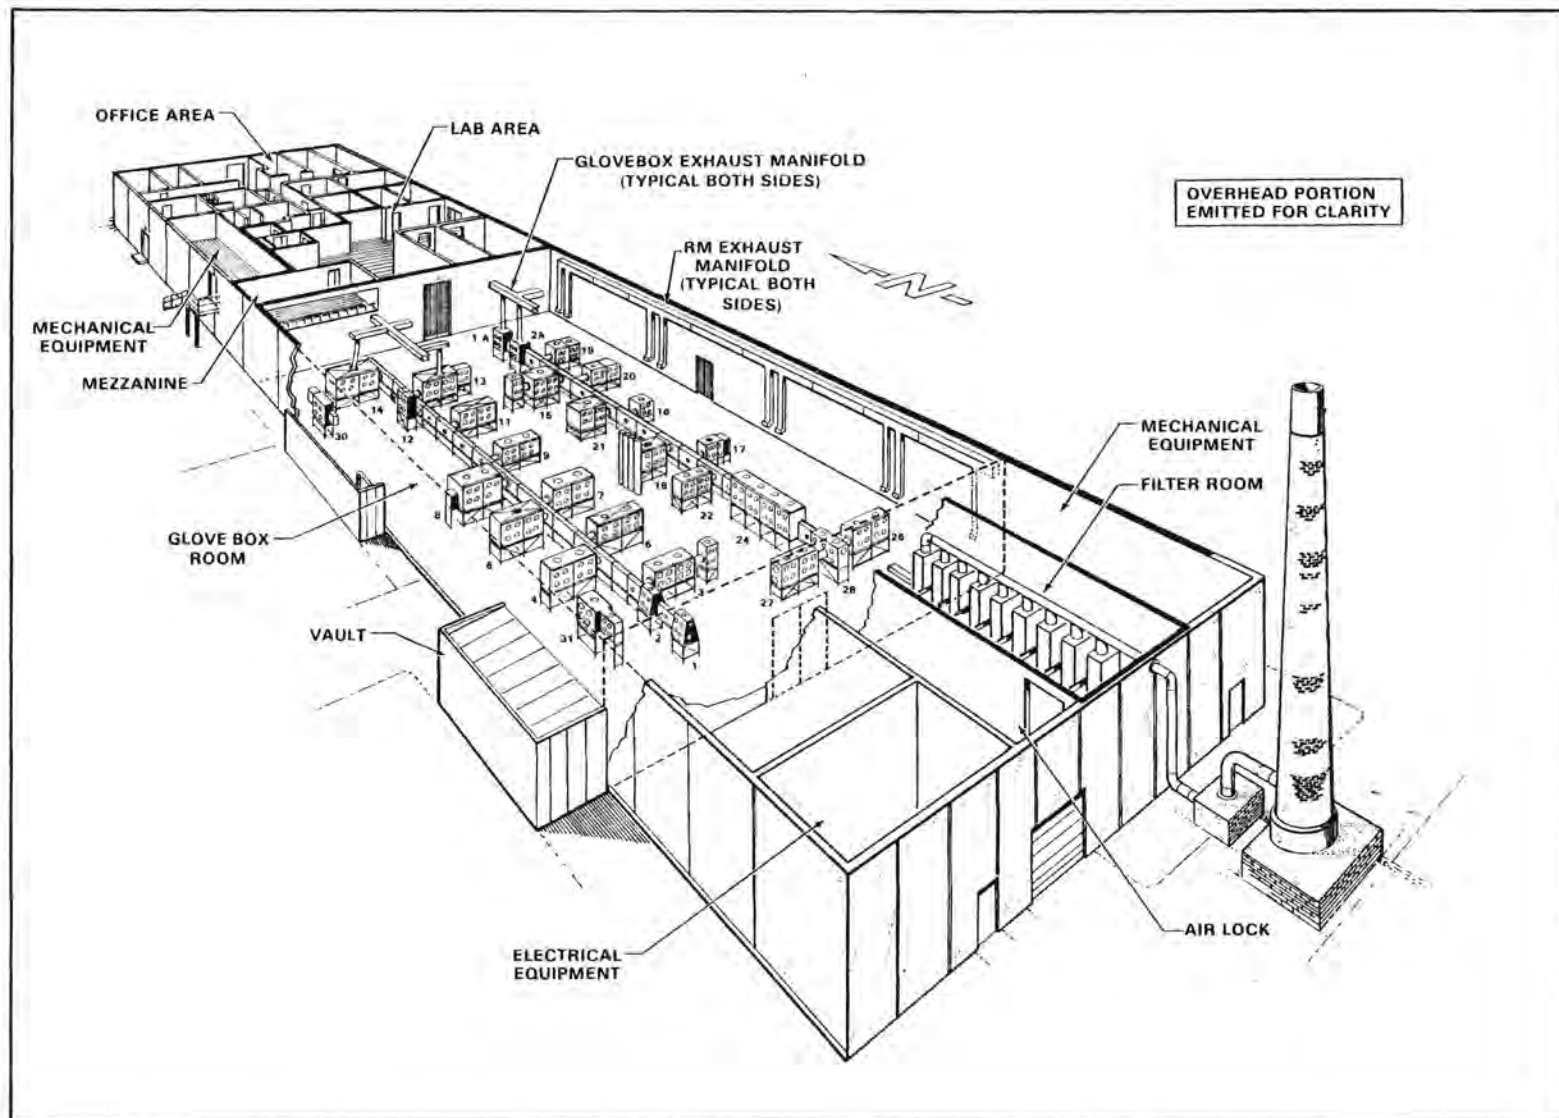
Isometric Drawing of NMD with Glovebox Arrangement
